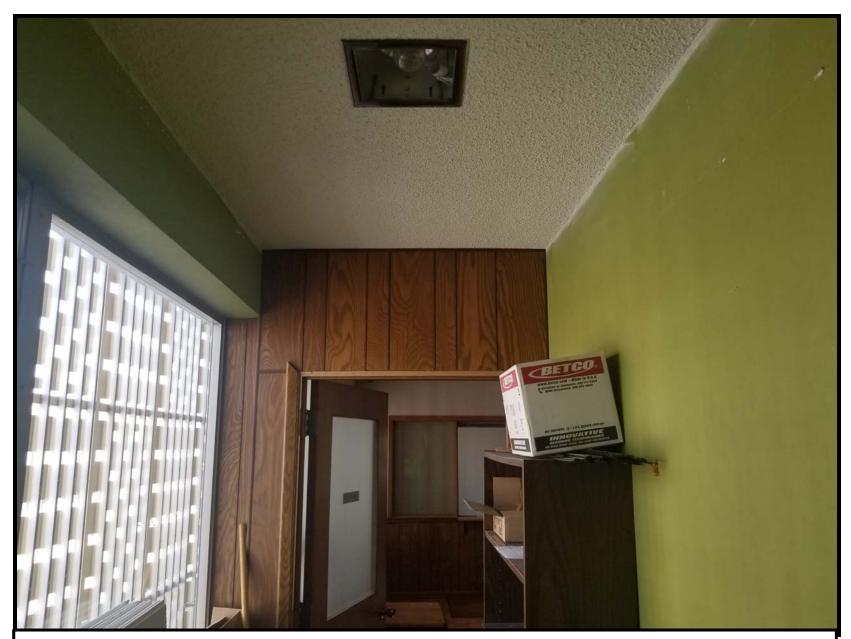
Looking north from within storage room east of elevator on second floor.
